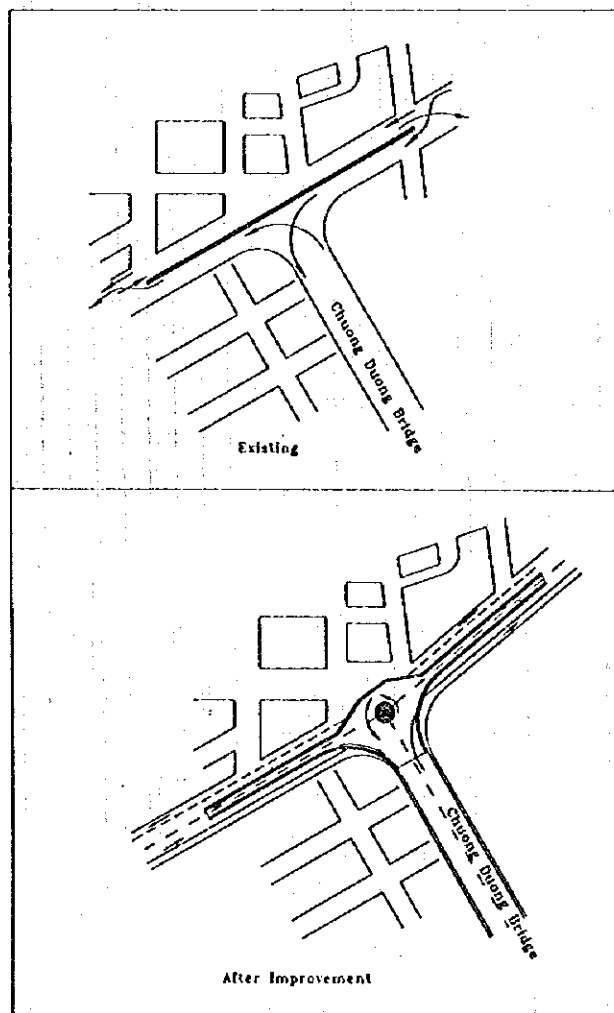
Chuong Duong Bridge Intersection Improvement Scheme
